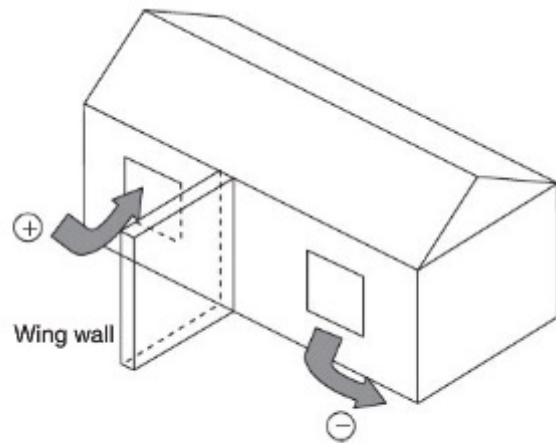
Use of a wing wall to help natural ventilation of windows located on the same side of the wall.
